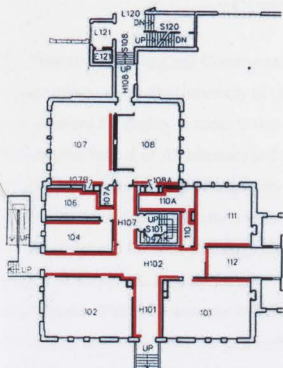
FIRST FLOOR EDUCATION BUILDING
